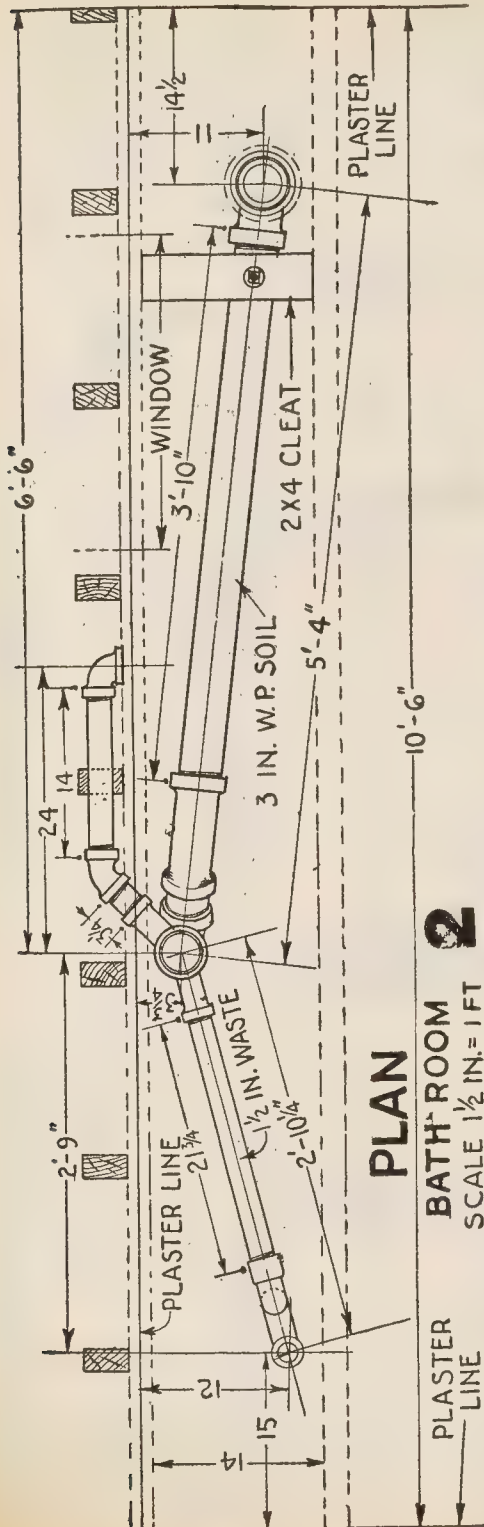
,975.—Plan of roughing in for bath room showing dimensions with wrought pipe and recessed screwed fittings, called drainage fittings and also known as the Durham system.
